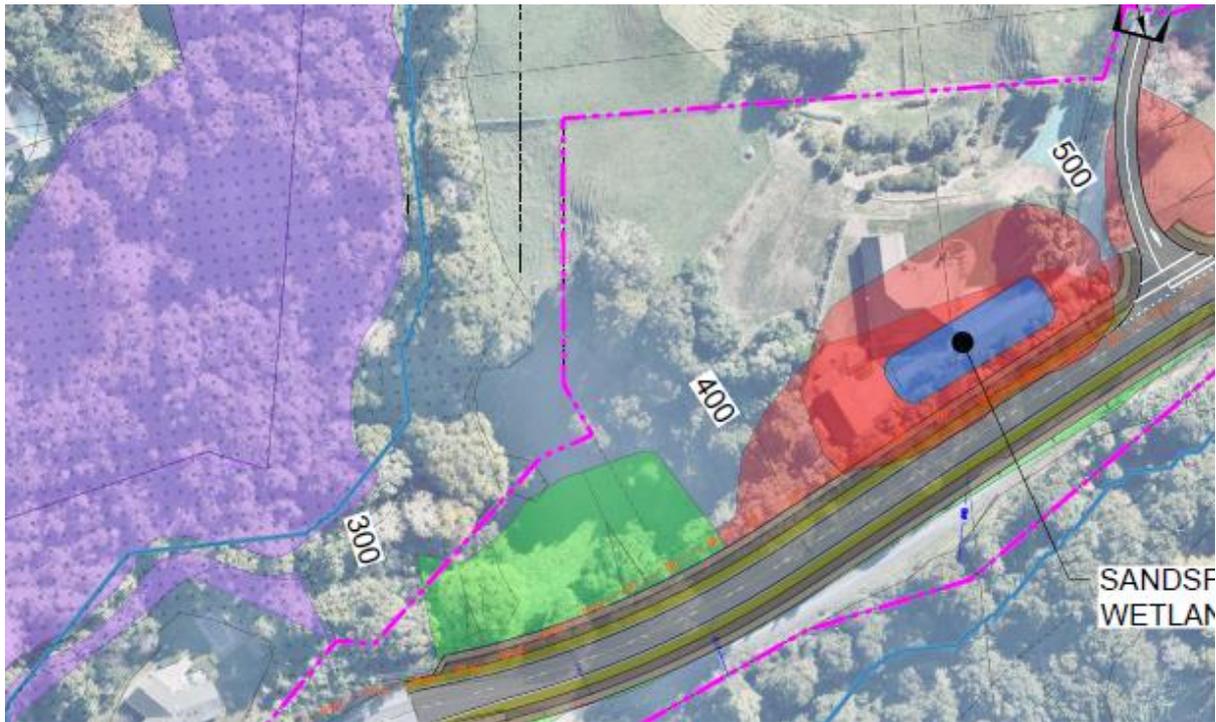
Space for extensive planting north of the stormwater treatment wetland.
